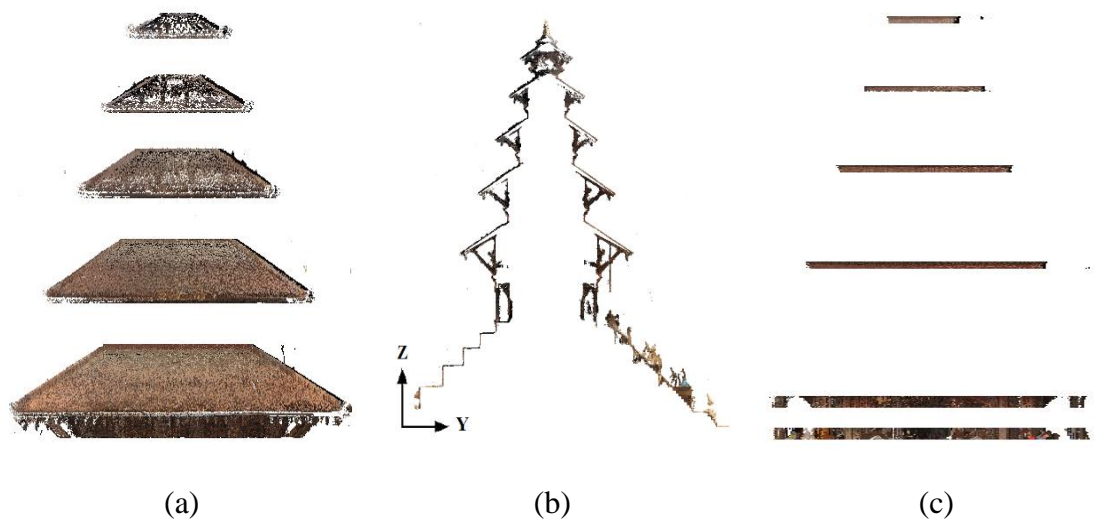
Point cloud segments: (a) roofs, (b) section cut in the (YZ) direction, and (c) floors.
